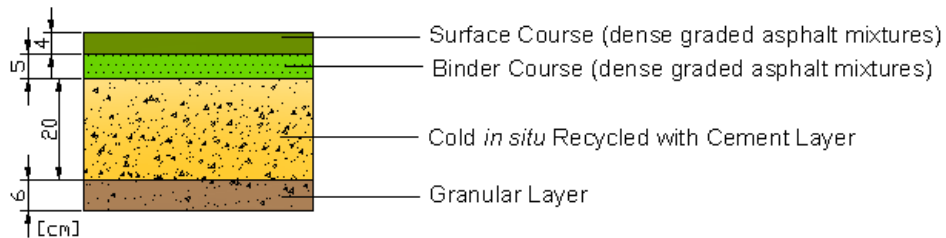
Pavement structure for solution B (km 46+000 to km 64+000)
